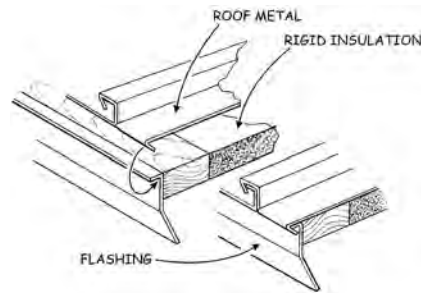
INTERLOCKING STANDING SEAMS ON METAL ROOF CAP SYSTEM
